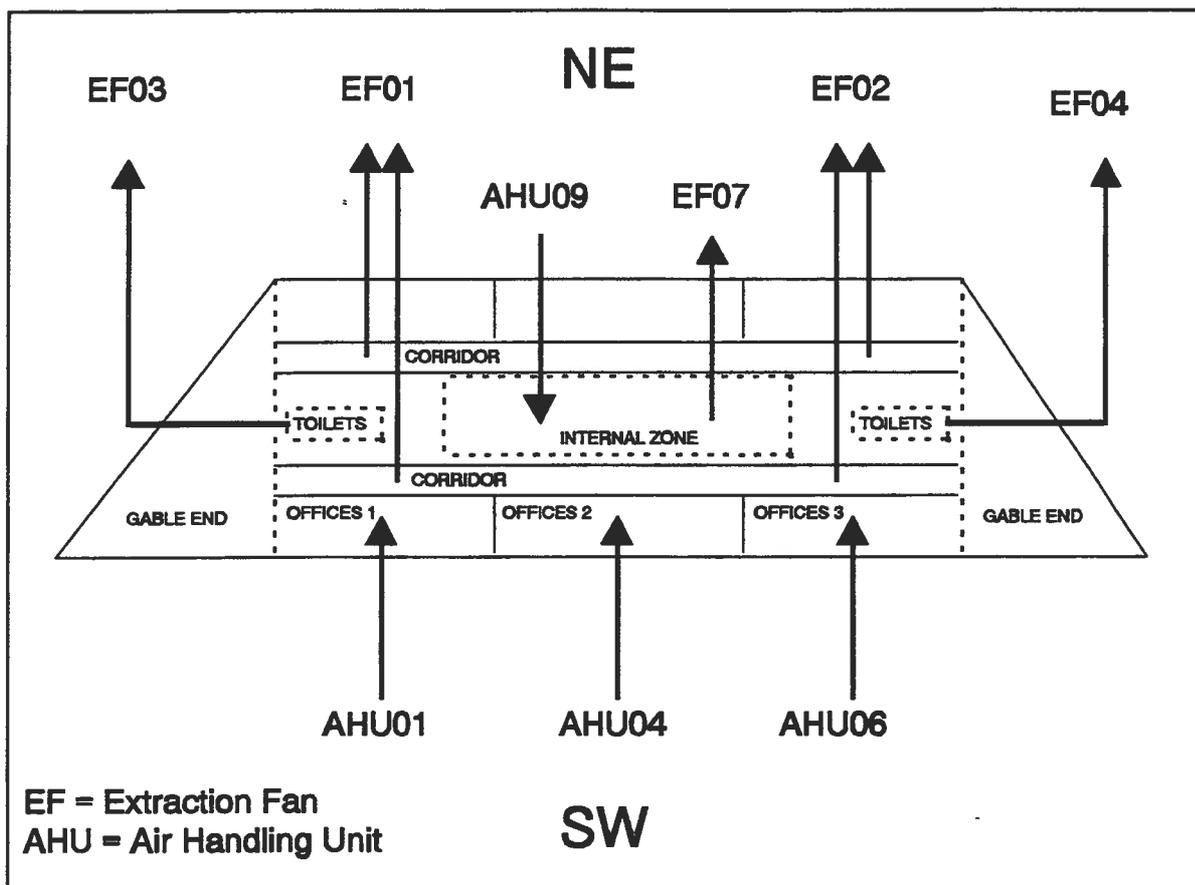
Sectional view of the French building. The air units which were measured are shown.
